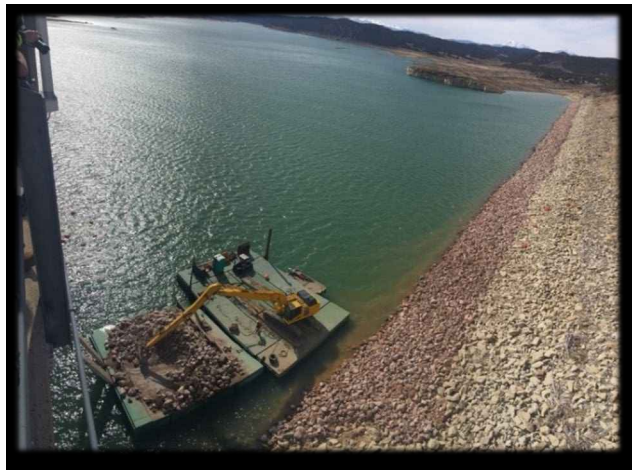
Barges and excavator being used to transport and place riprap on upstream slope.
